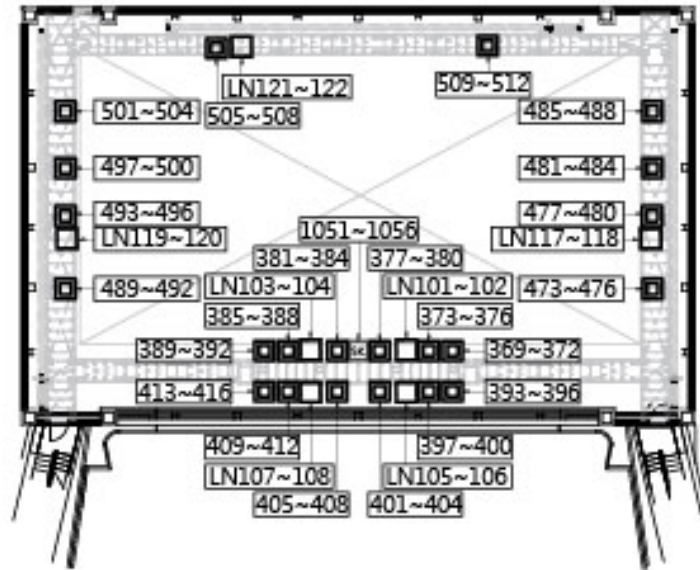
The Third Floor Gallery and Lighting Bridge Circuit Layout
